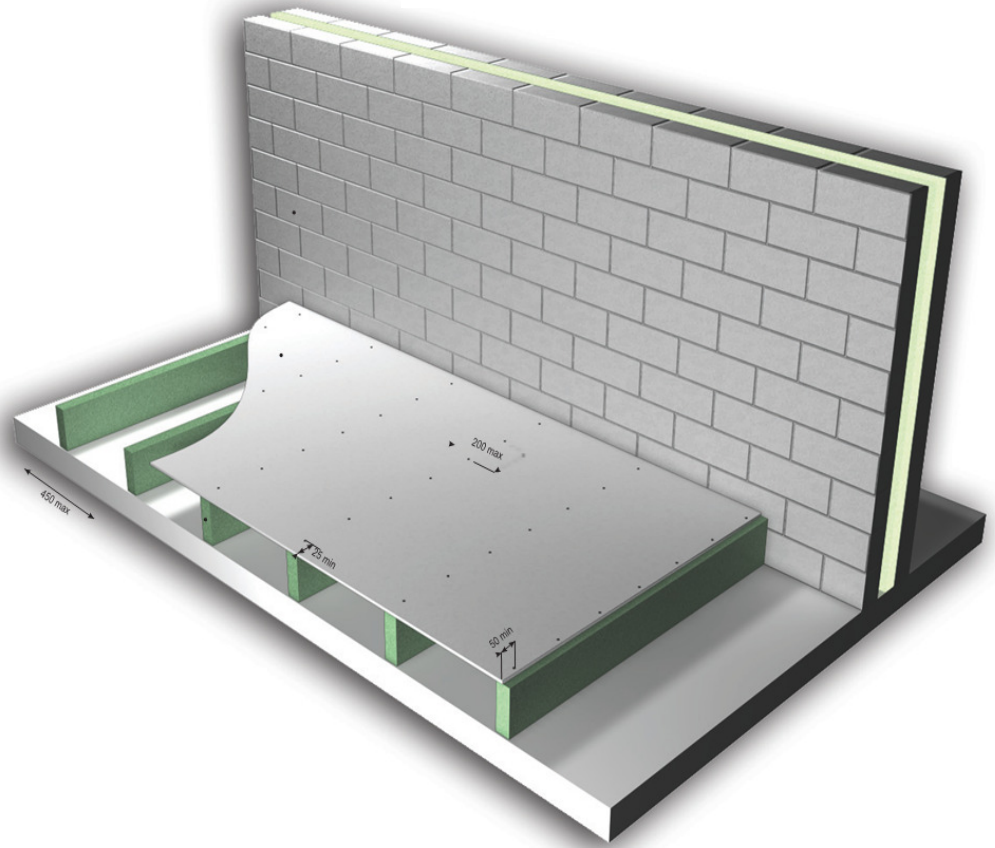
Floor Installation Perspective View for 18mm MgO Corp Structural Flooring
